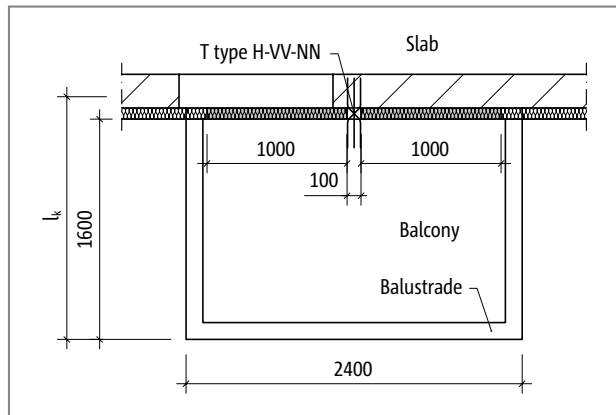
Schöck Isokorb® T type K-E, K-T with type H: Static system, layout
